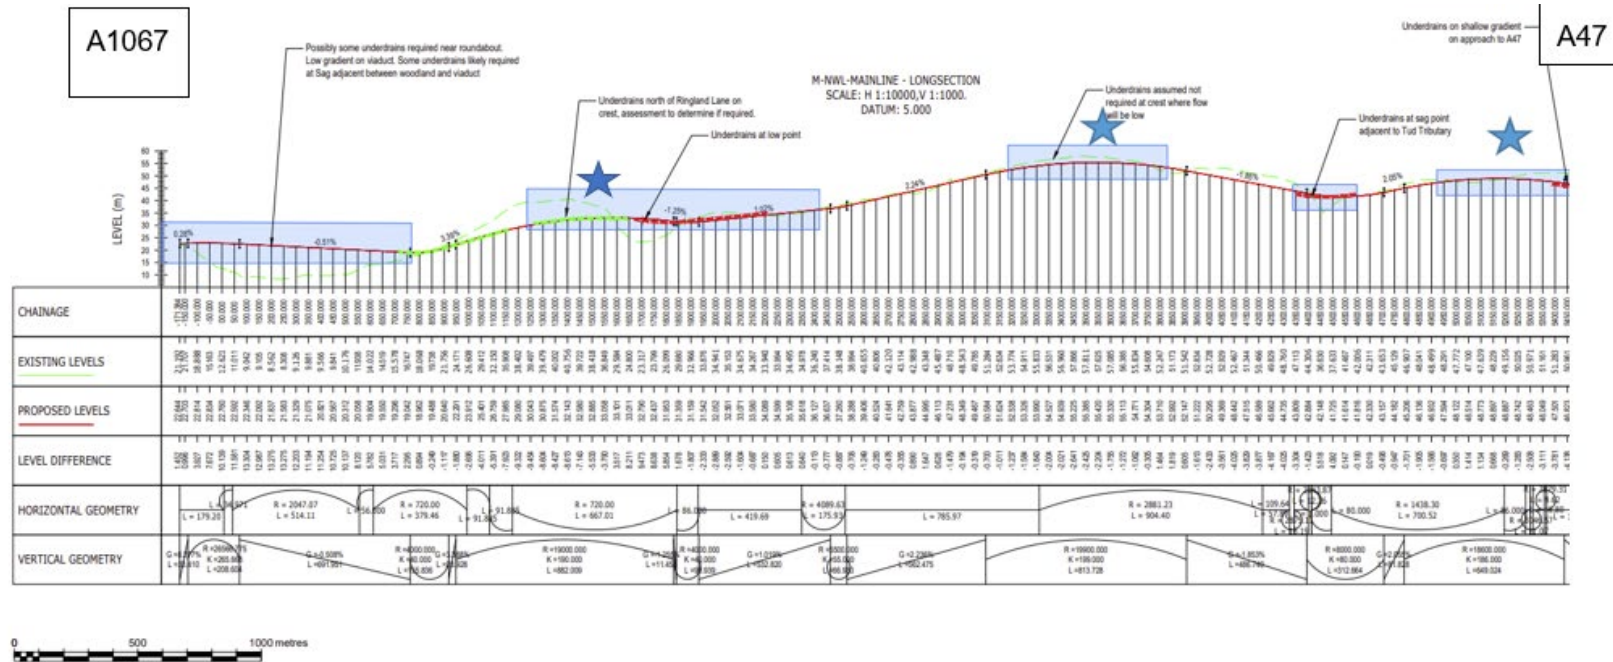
Swale Underdrains Long section of NWL showing where swale underdrains are omitted.
